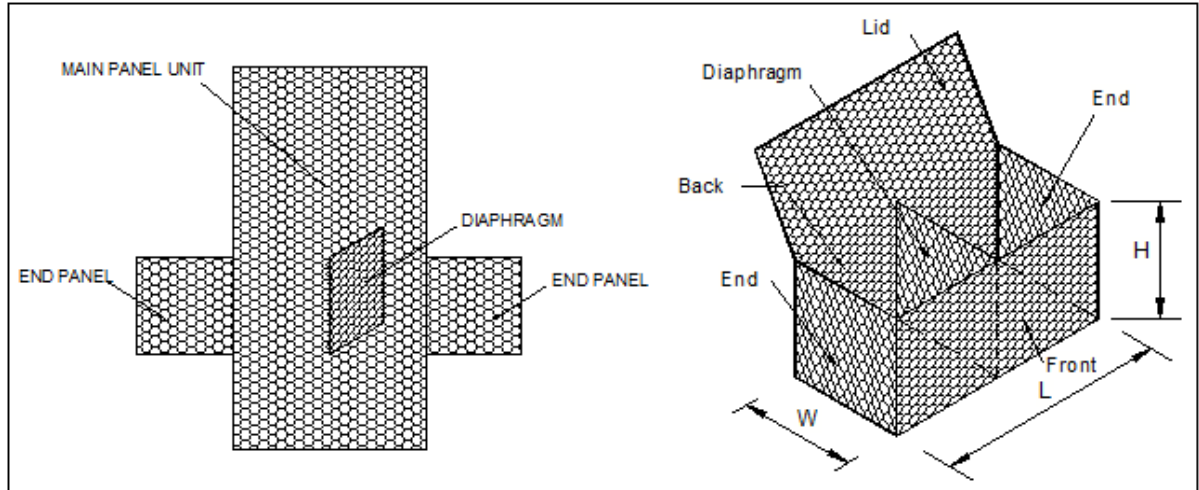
Unfolded and assembled double twisted wire mesh Gabion
